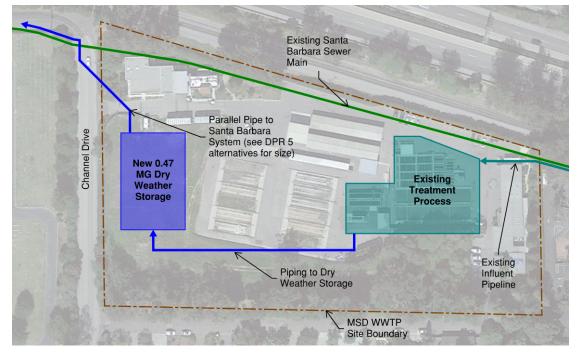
Santa Barbara DPR Infrastructure Site Plan
